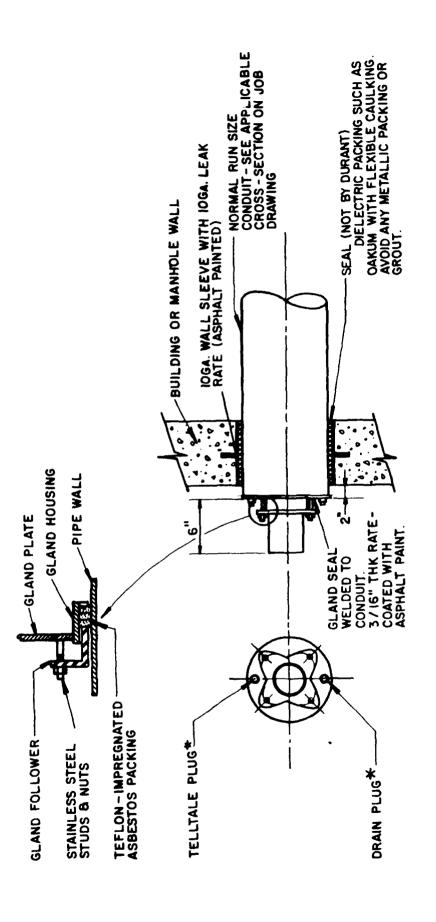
Schematic diagram showing representative concrete wall/foundation penetration for buried-conduit-type heat-distribution system.
